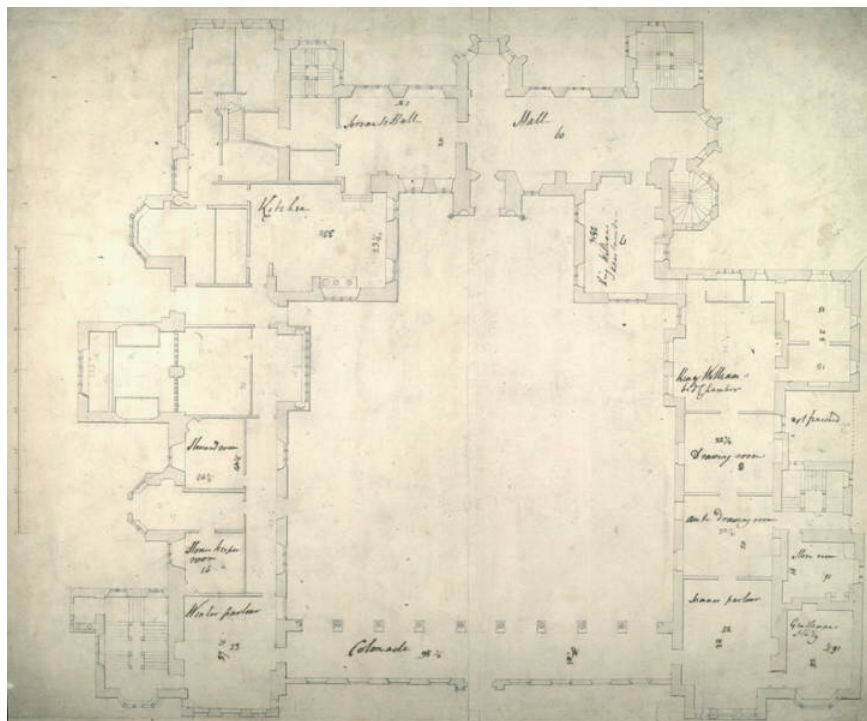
plan of the ground floor of old Copped Hall, made in the 1740s
